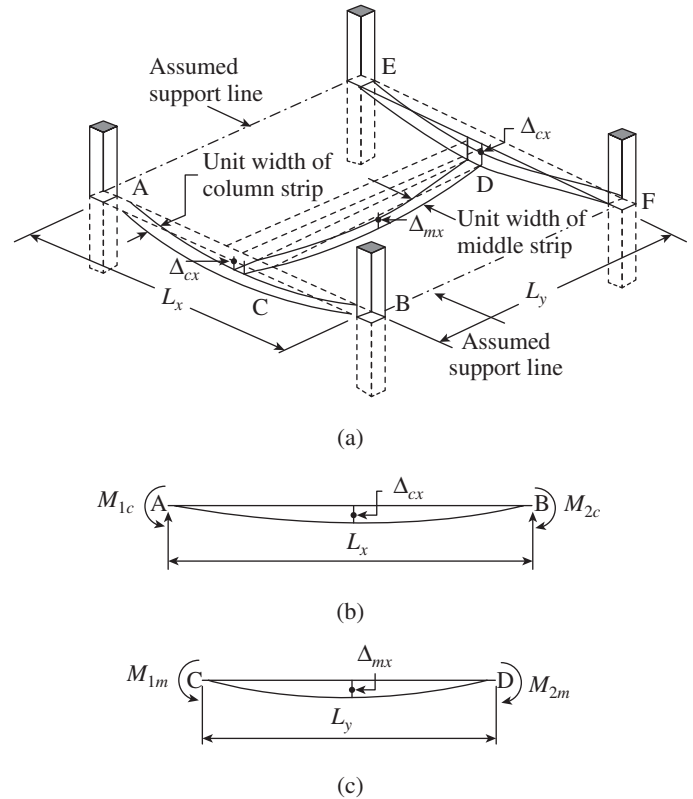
Slab deflection using crossing beam approach (a) Rectangular panel in a column supported two-way slab (b) Deflection of column strip (c) Deflection of middle strip
